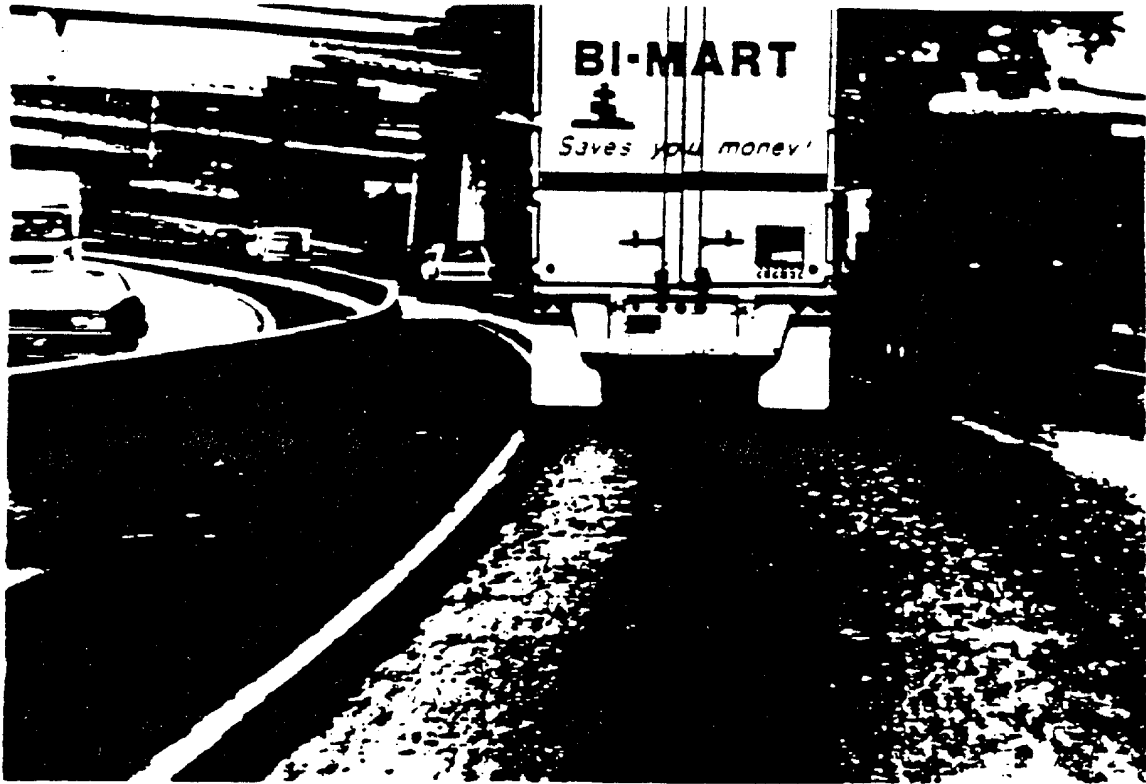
Dual wheel split between shoulder and edge of PCC pavement. Note the pavement edge stripe location (12-foot PCC pavement slabs).
